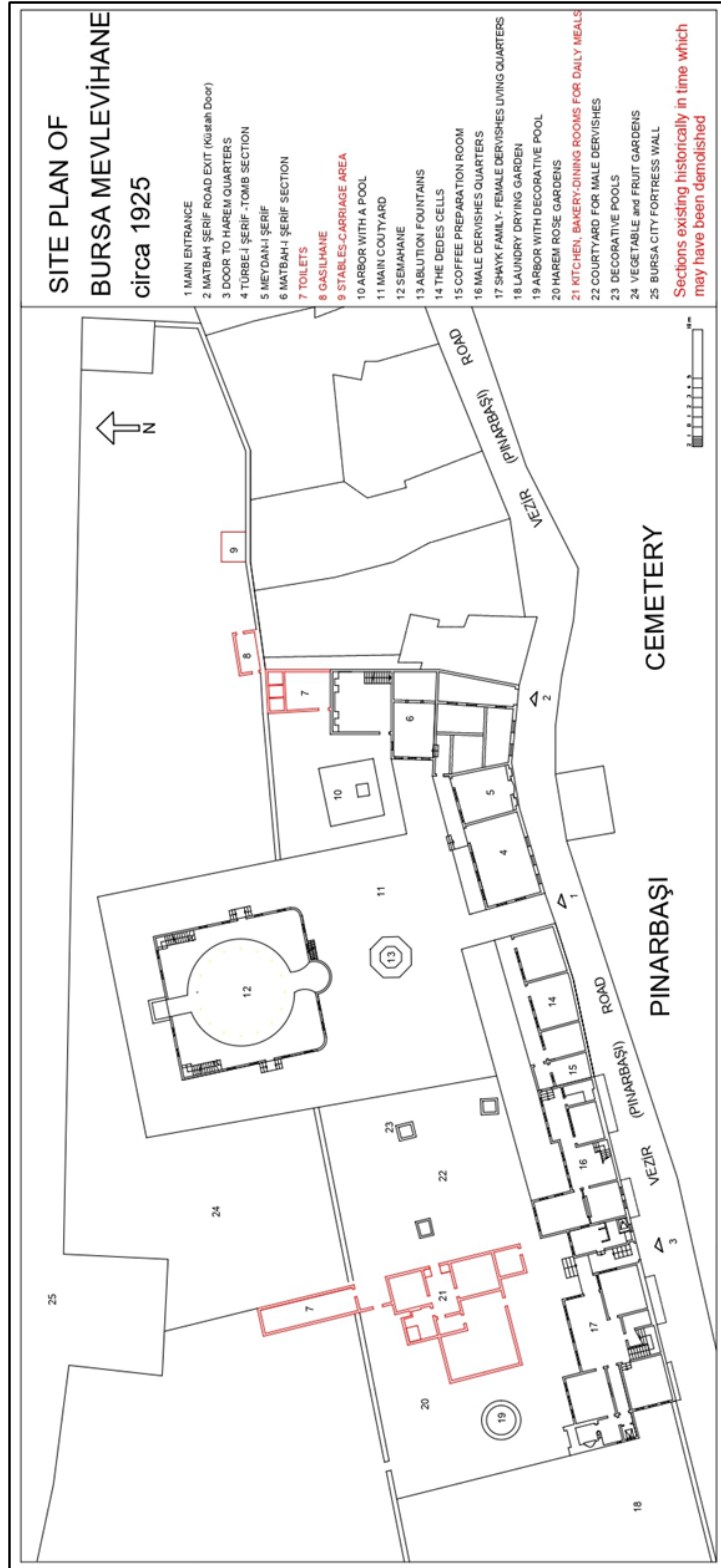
The proposed site plan of the Bursa Mevlevihane Asitâne around 1925
